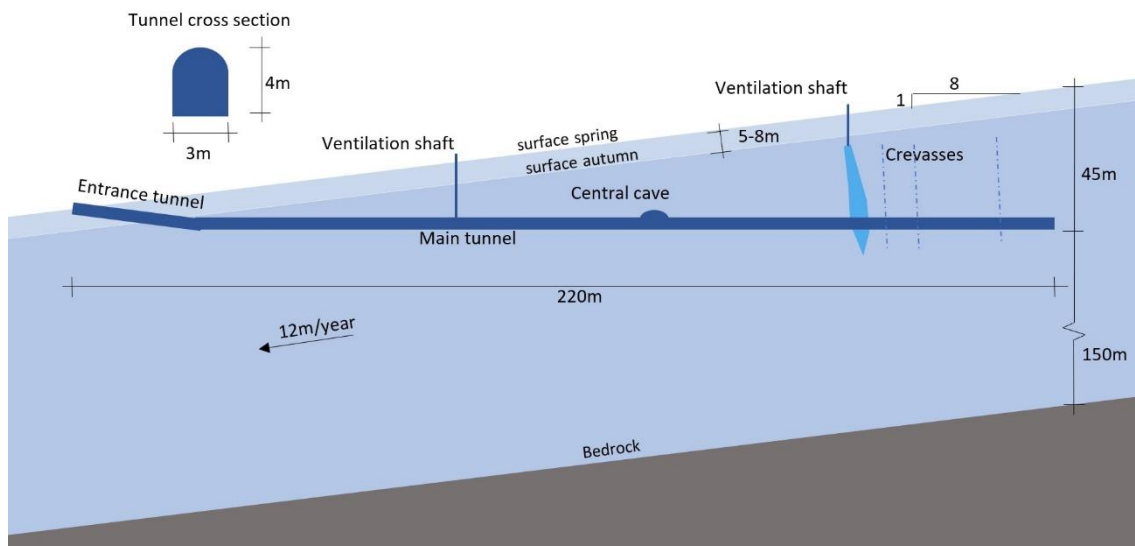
Cross-section and longitudinal profile of the ice tunnel.
